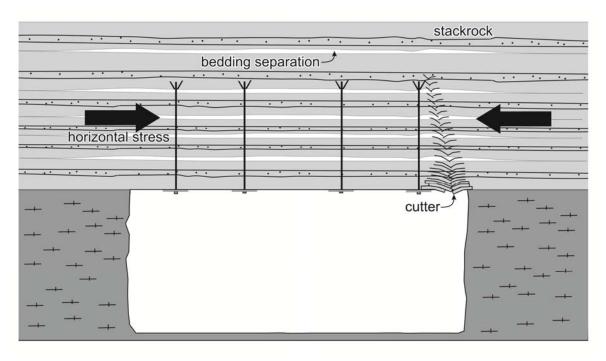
Stackrock delaminates and cutters form when roof is subjected to horizontal stress
